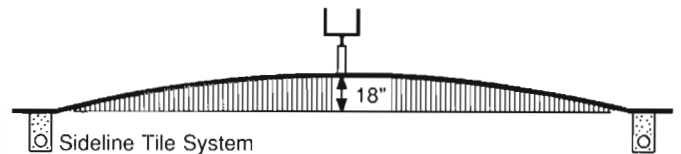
Cross section of a football field showing crown to provide surface drainage.
